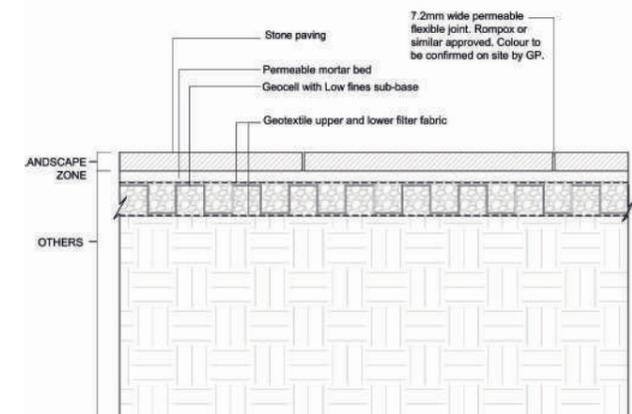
MAIN PATH STONE PAVING TYPICAL DETAIL
